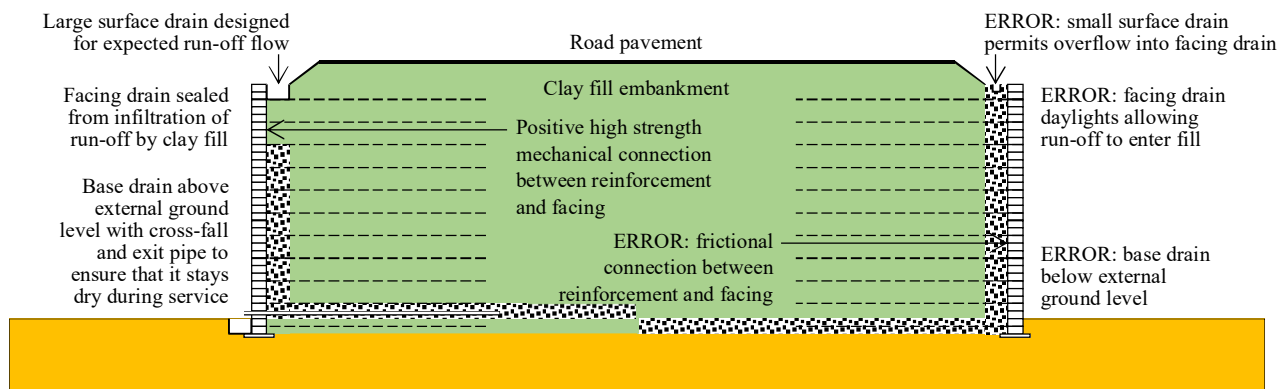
Typical back-to-back highway embankment with drainage features: preferred on the left, to be avoided on the right
